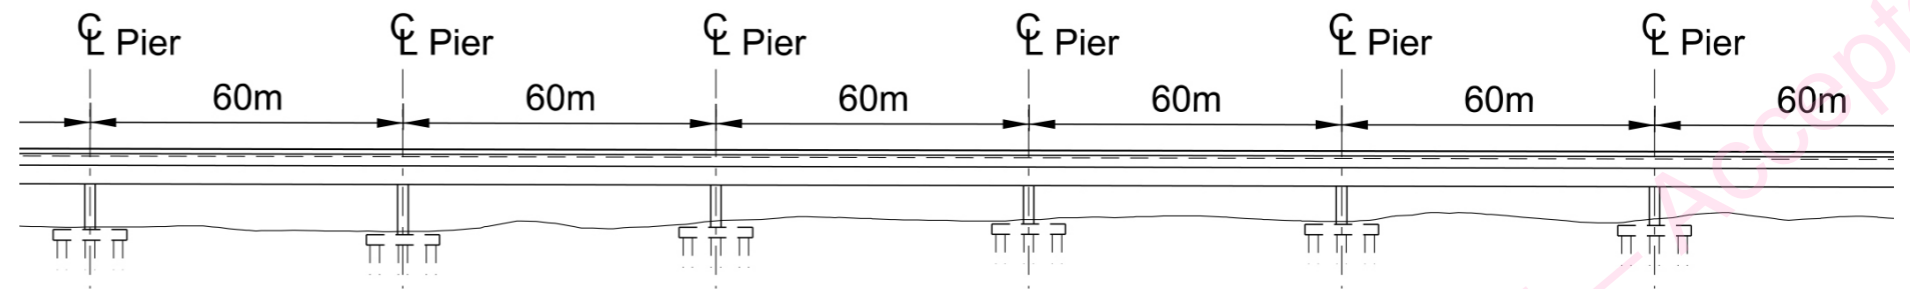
\_ HS2 Ltd design to support Hybrid Bill - Proposed elevations over land
